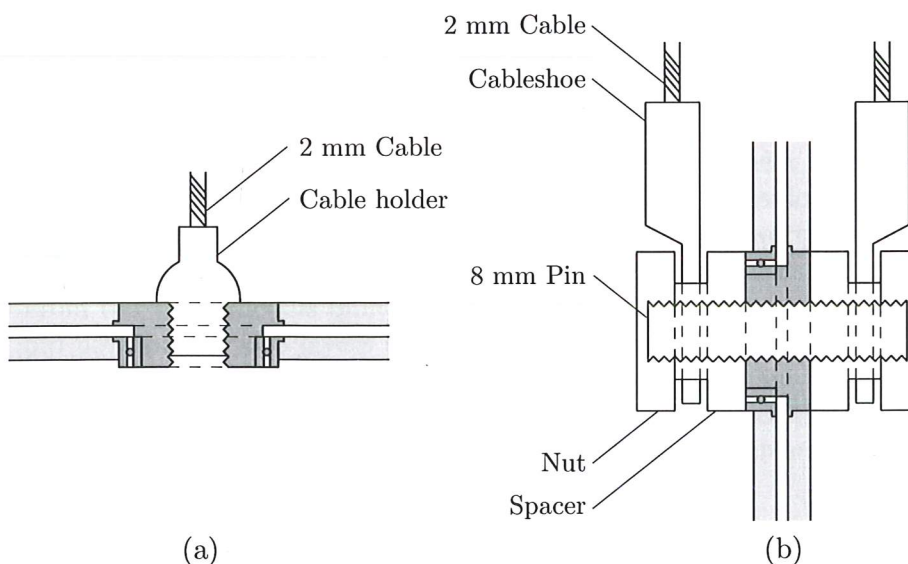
Details of support cables in (a) Horizontal, and (b) Vertical configurations, scale 1:1
